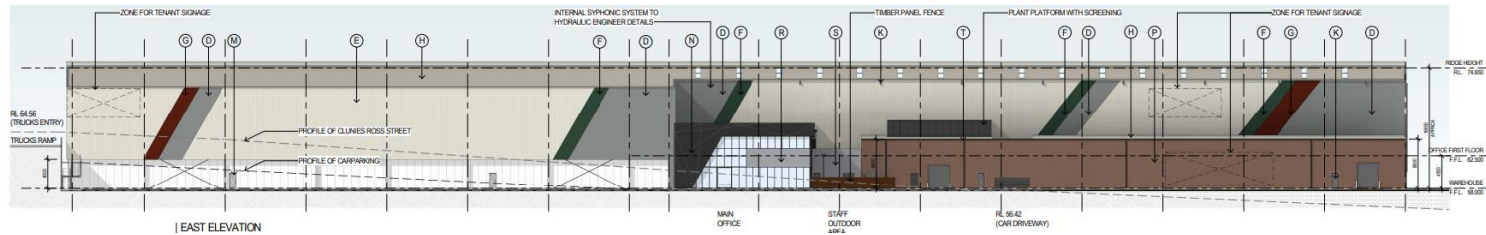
Proposed Eastern Elevation (Source: Watson Young)
